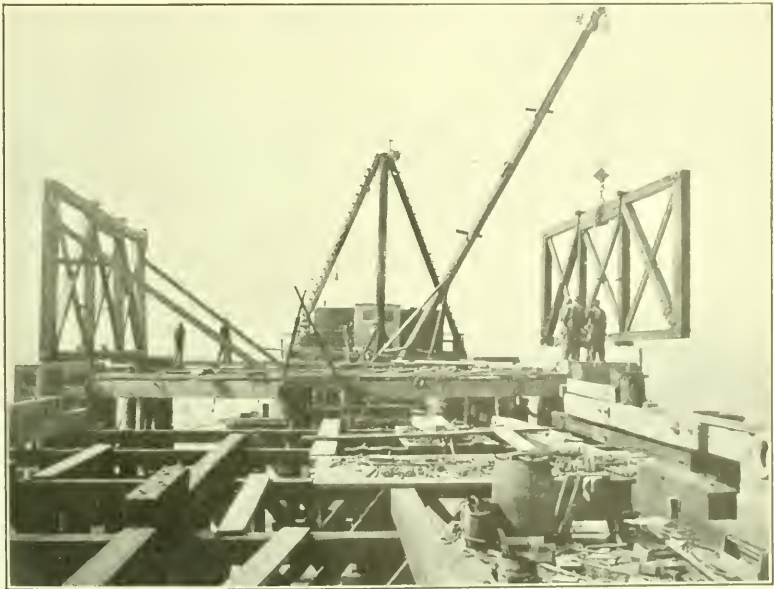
ERECTION OF FALSEWORK FOR PIVOT PIER, DUMBARTON POINT DRAW.
